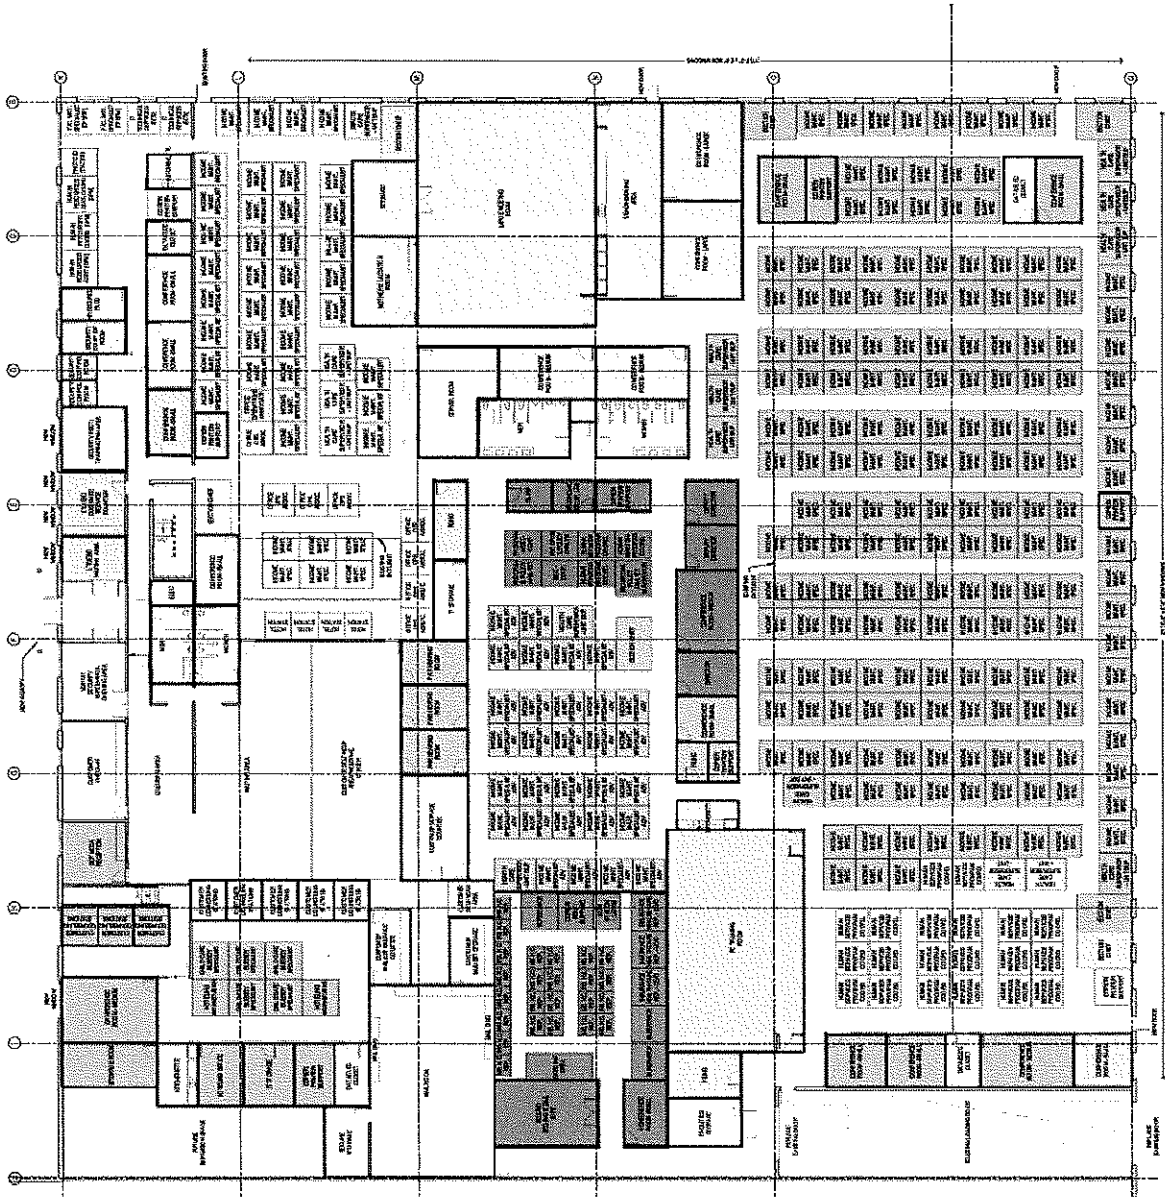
AERIAL PHOTO / SITE PLAN
